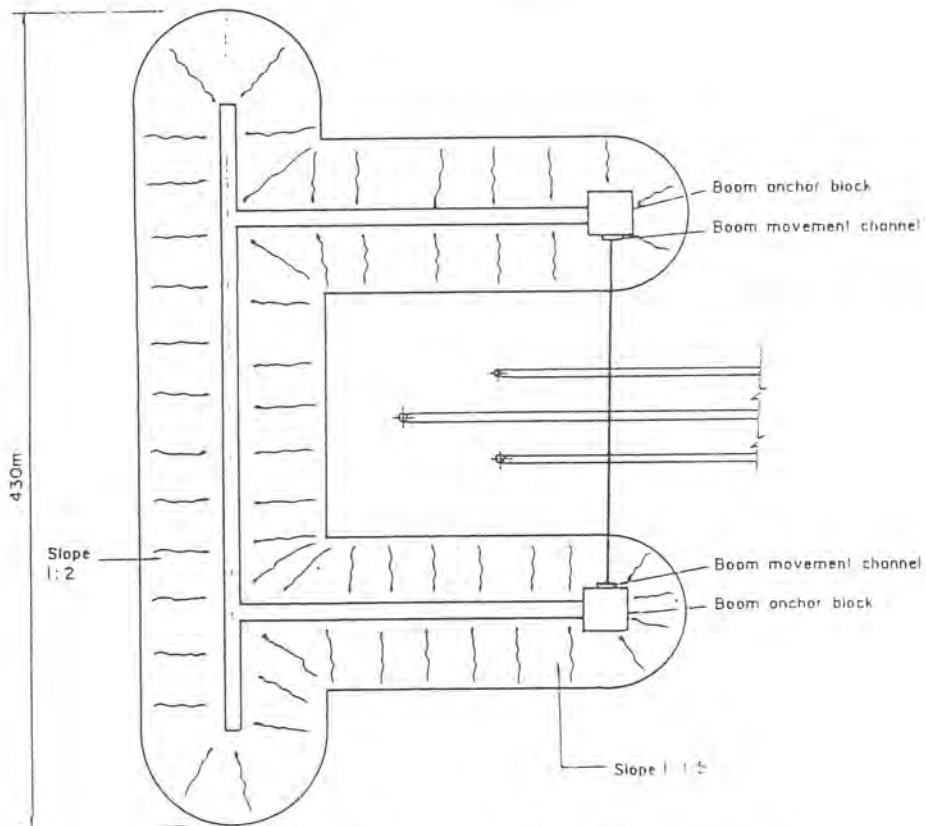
PLAN OF BREAKWATER SCHEME C
